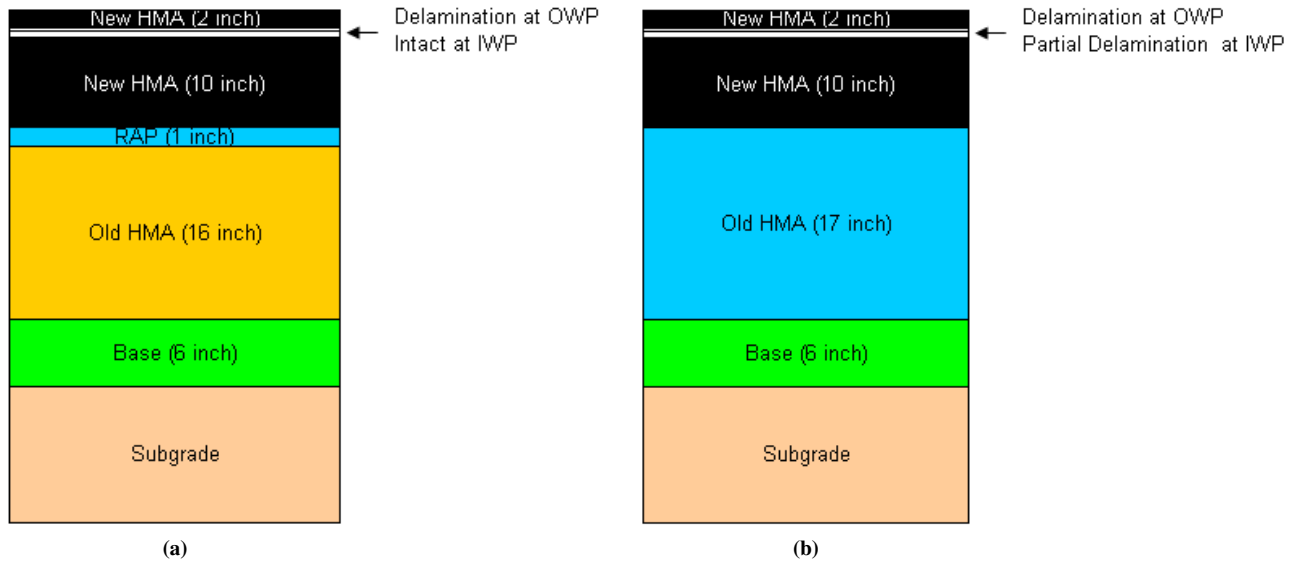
Pavement structure layout of NCAT Section 4 (not to scale) for (a) Test 6 and (b) Test 7.
